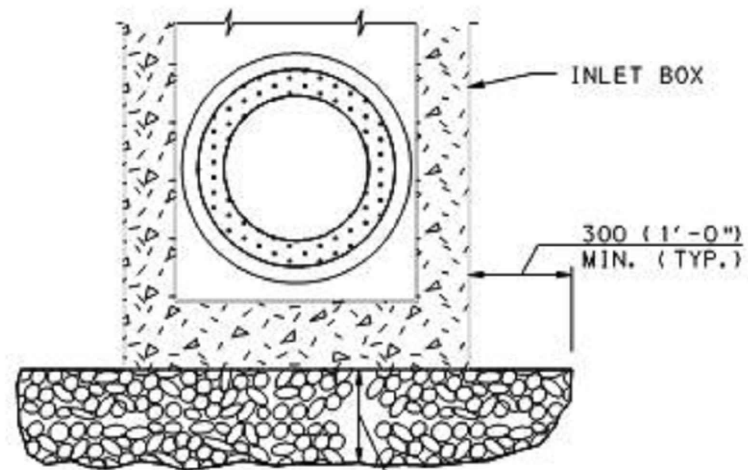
DETAILS FOR DRAINAGE STRUCTURES AS ADOPTED FROM PENNDOT PUBLICATION 72M: STANDARDS FOR ROADWAY CONSTRUCTION, DATED JUNE 2010.
